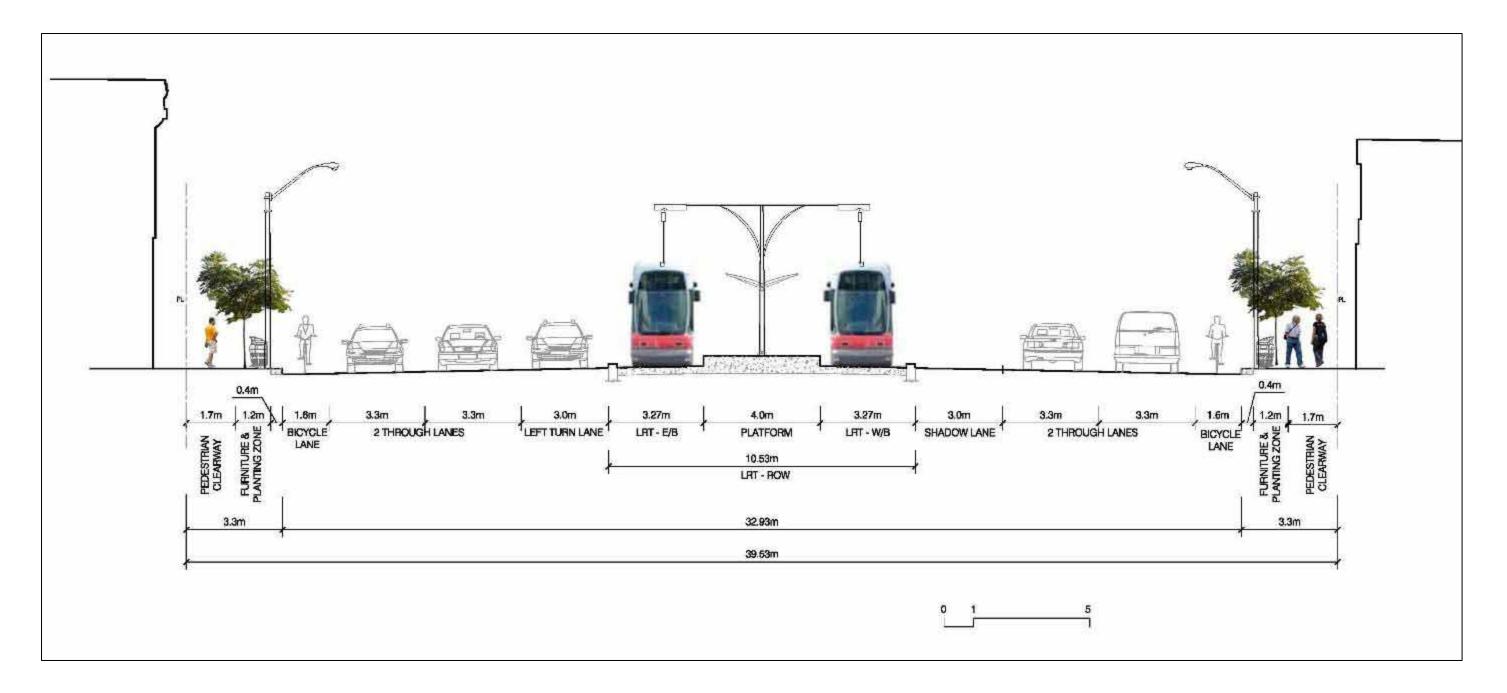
Typical Intersection Cross Section (Centre Platform Stop)
